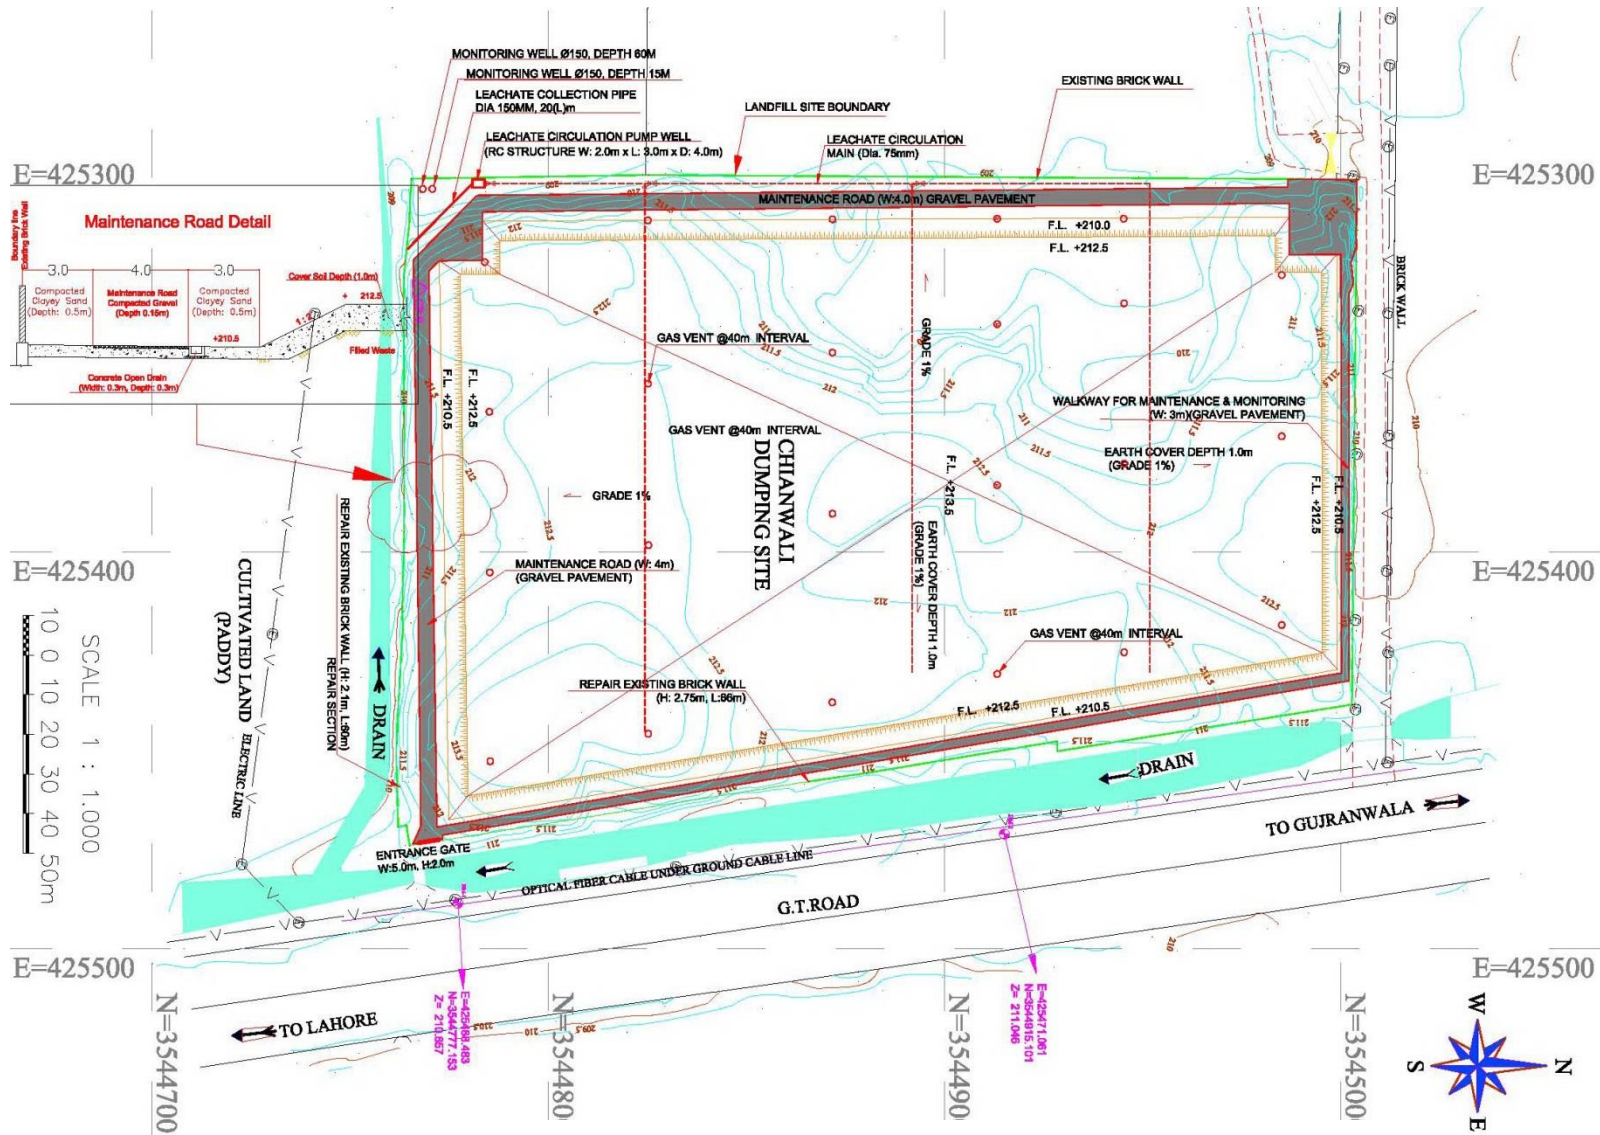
Layout Plan of Safe Closure Work at Chianwali Former Disposal Site
